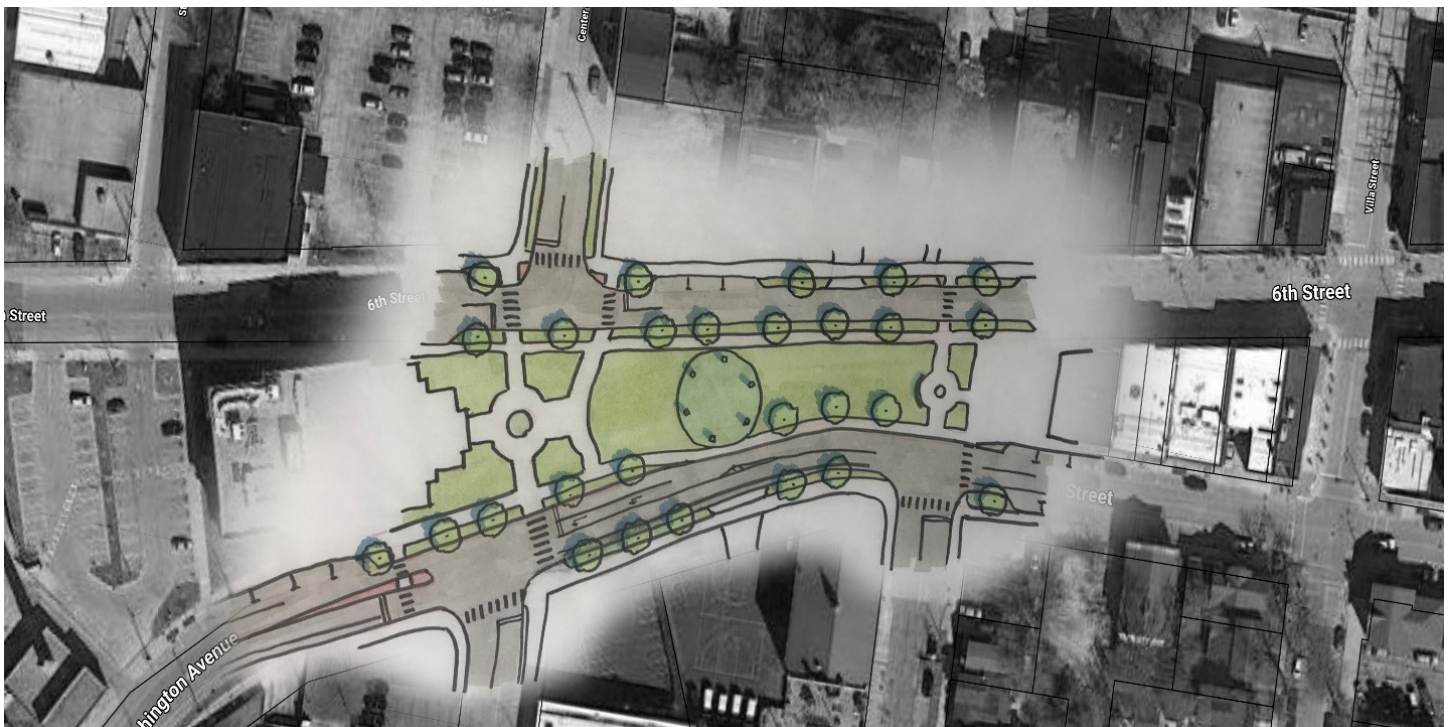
Simple geometric changes can transform the roundabout into an accessible public space.
